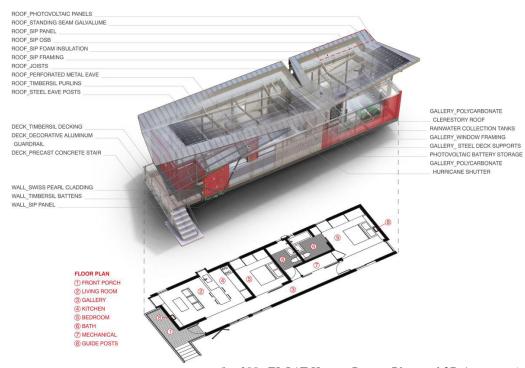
FLOAT House, Recent Plan and 3D Axonometic
